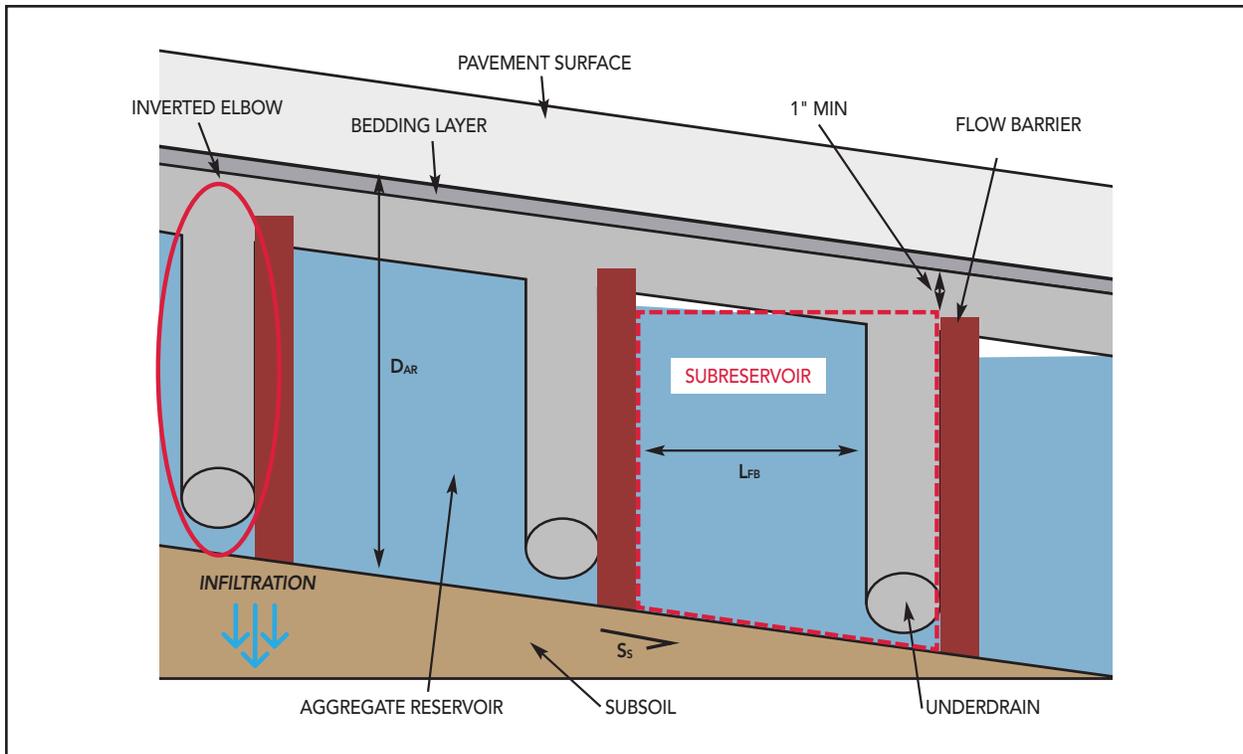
Profile View of a Sloped Permeable Pavement System
